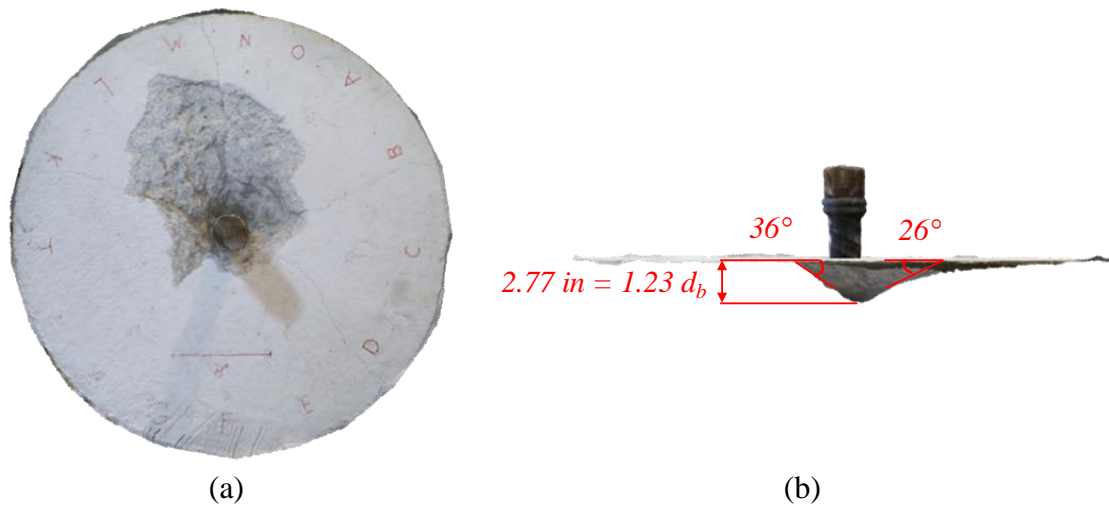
3D Point Cloud Model of Fracture Surface of Test Specimen #1: (a) Plan View; (b) Cone Shaped Fracture
